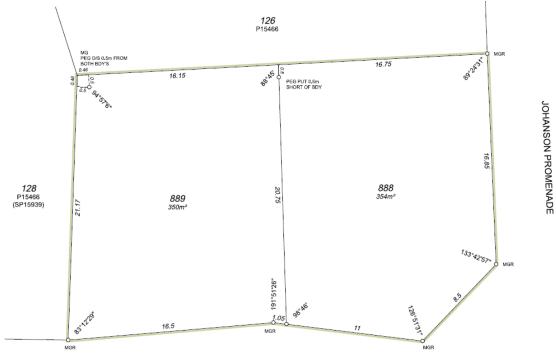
Subdivision plan at 20 Johanson Promenade, Murdoch.
